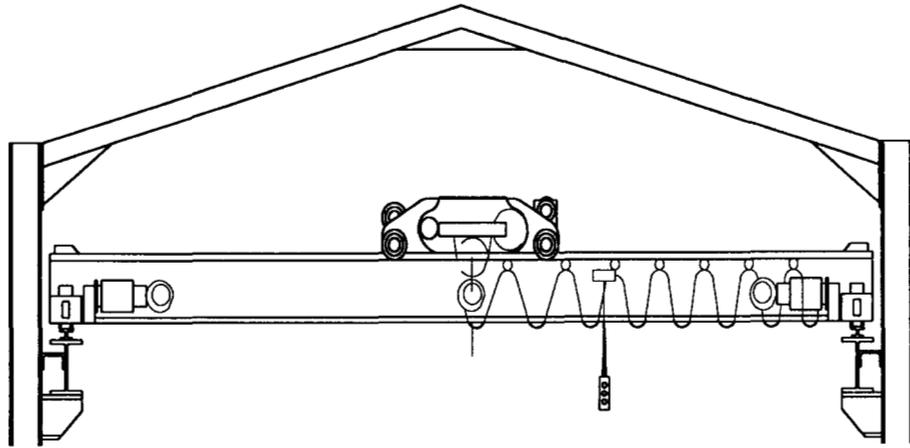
Double girder pendant controlled crane for loading class Q2
